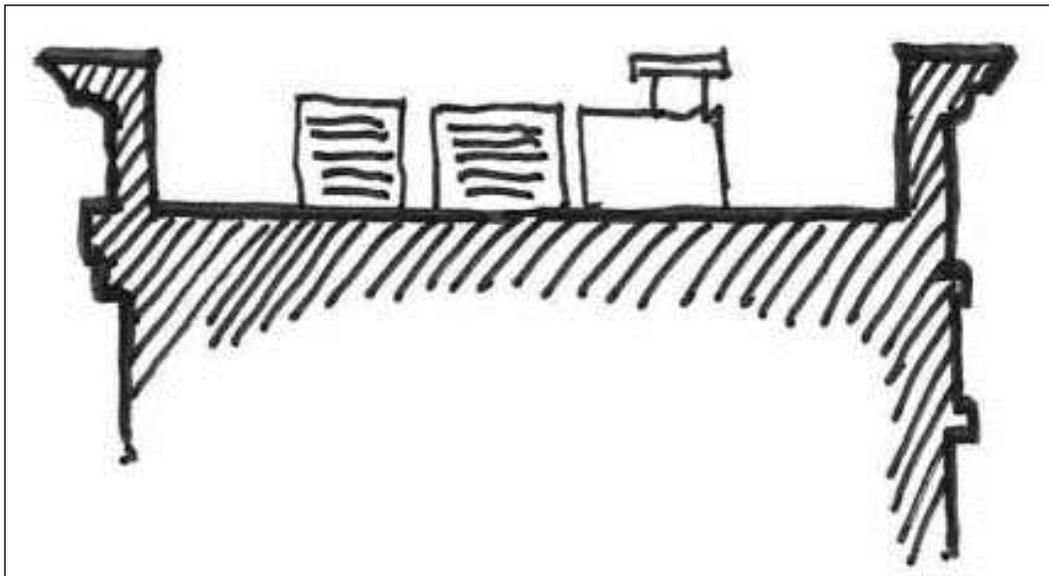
ROOFTOP EQUIPMENT SCREENING
